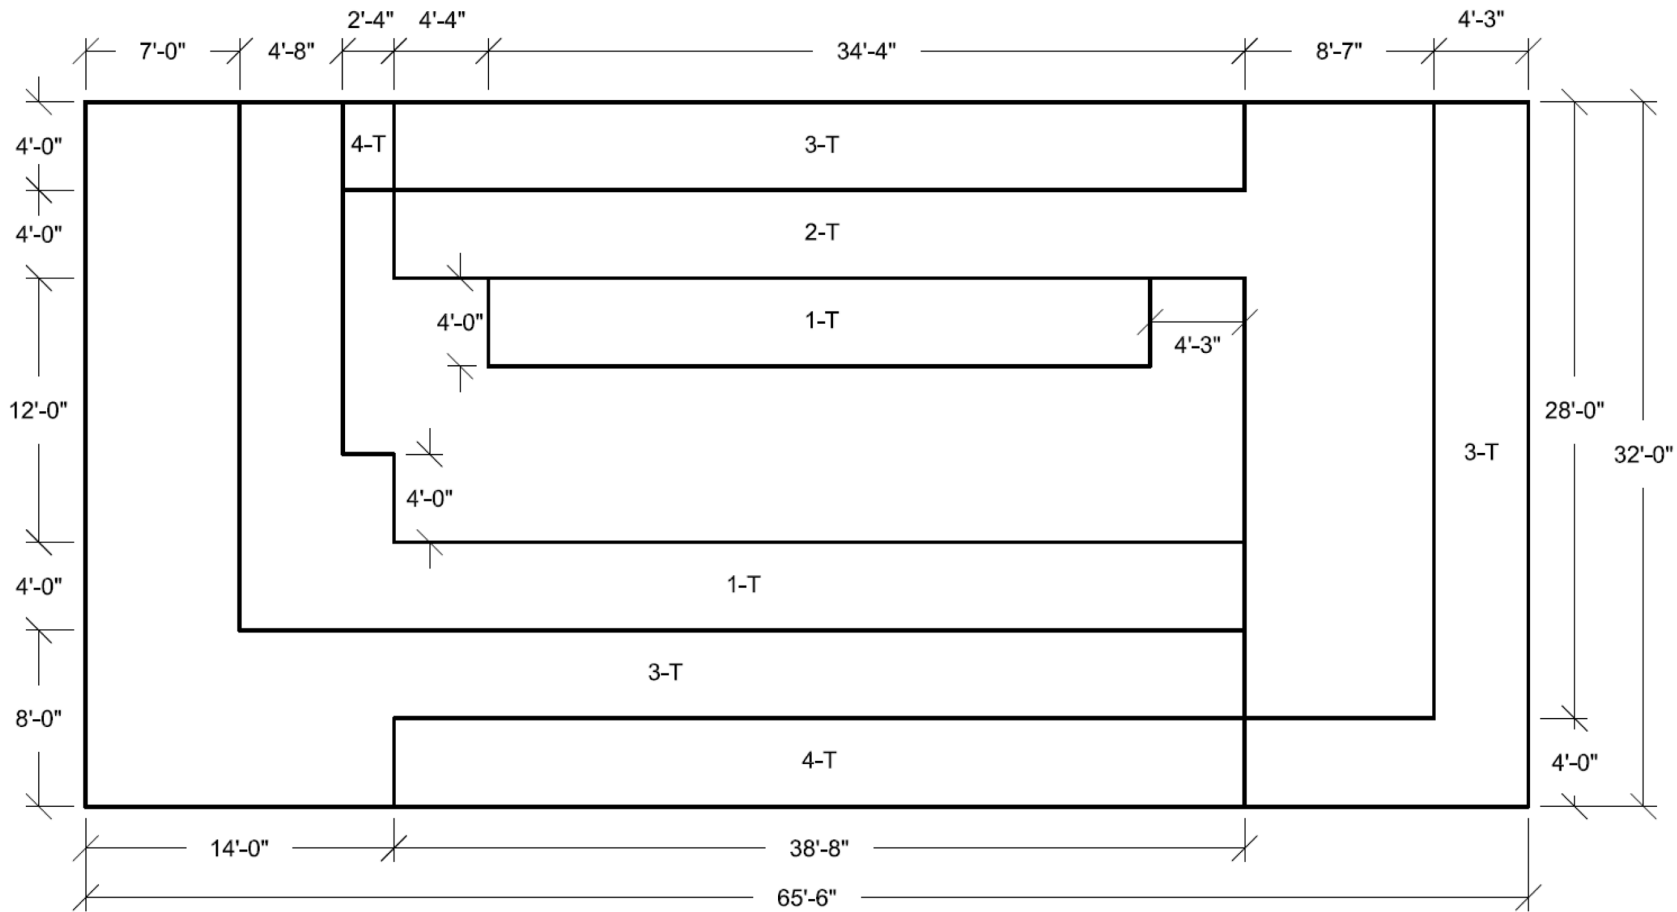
H.6-172 DGFOV Wall 8 Looking From Outside Transverse Reinforcement Zones
